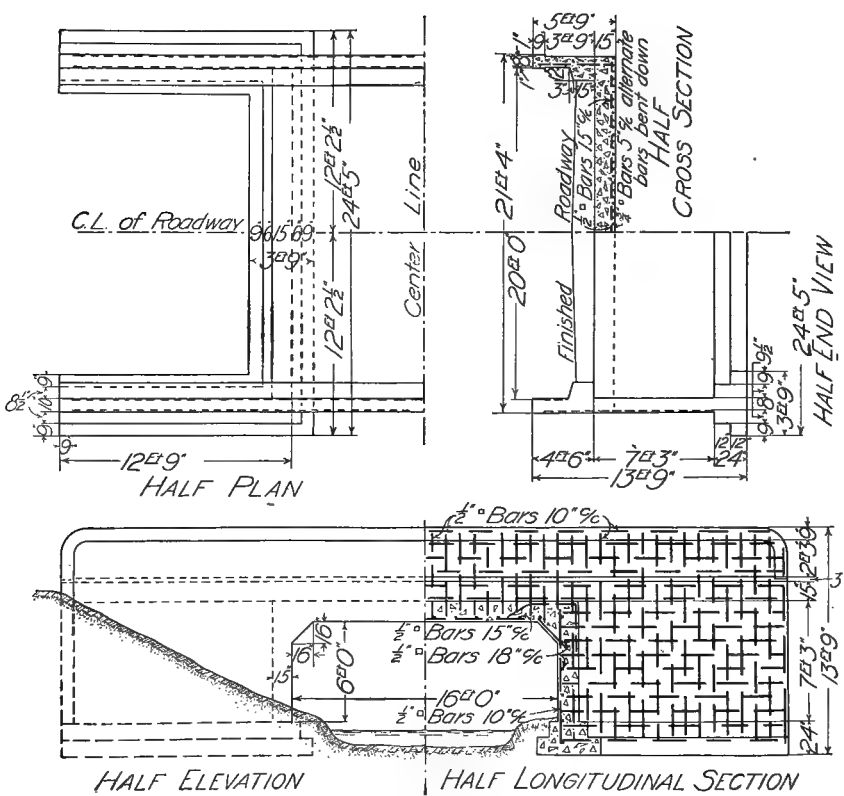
SLAB BRIDGE WITH SPAN OF 16 FEET.
